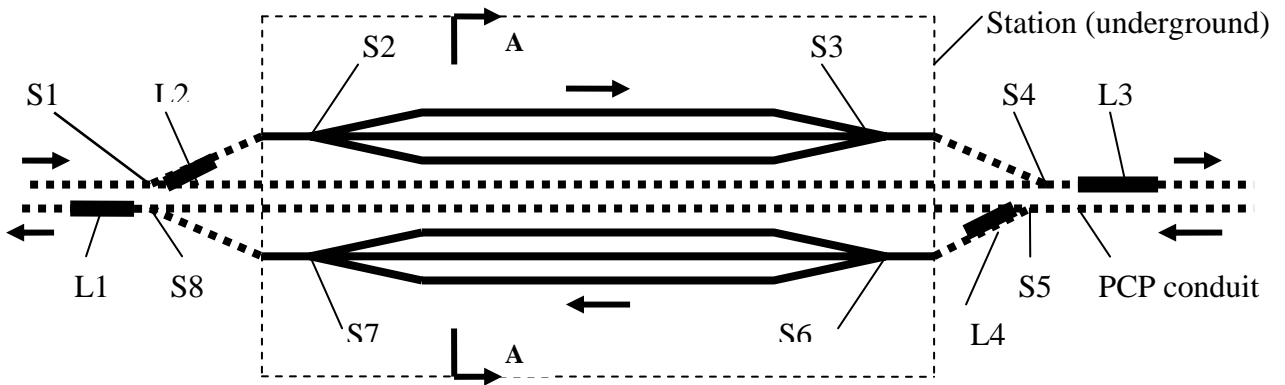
Layout (plan) of a typical underground station for pallet-tube PCP
